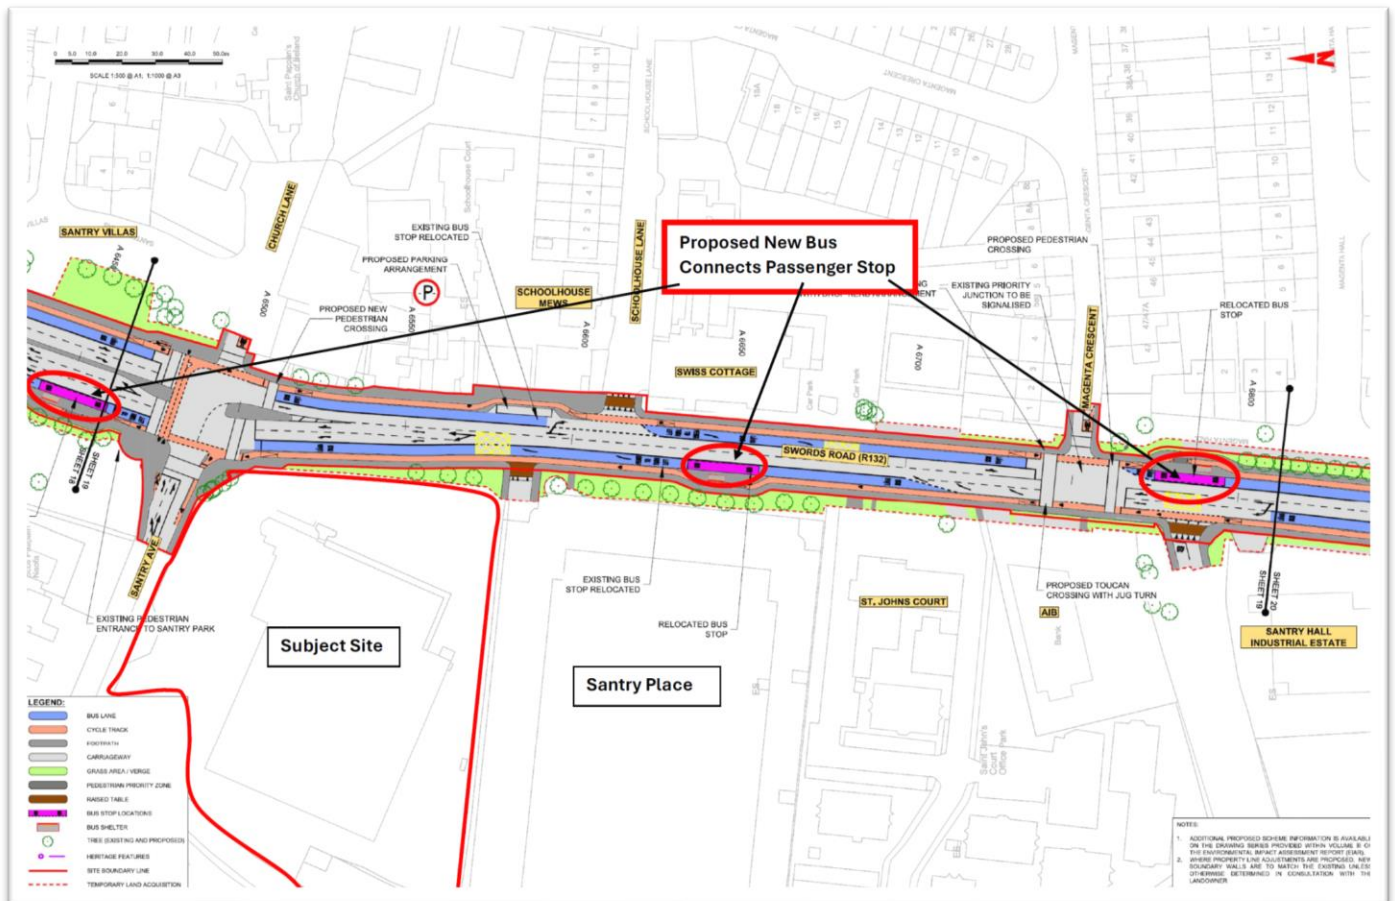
Extract from Swords to City Centre Core Bus Corridor Scheme General Arrangement Drawings, May 2023 (Drawing no. BCIDB-JAC-GEO_GA-002_XX_00-DR-CR-0019 by Jacobs for NTA). Subject site is identified, indicatively outlined in red with 3 no. proposed bus stops on the Swords Road Core Bus Corridor identified in close proximity to the subject site i.e. within c.65m.
